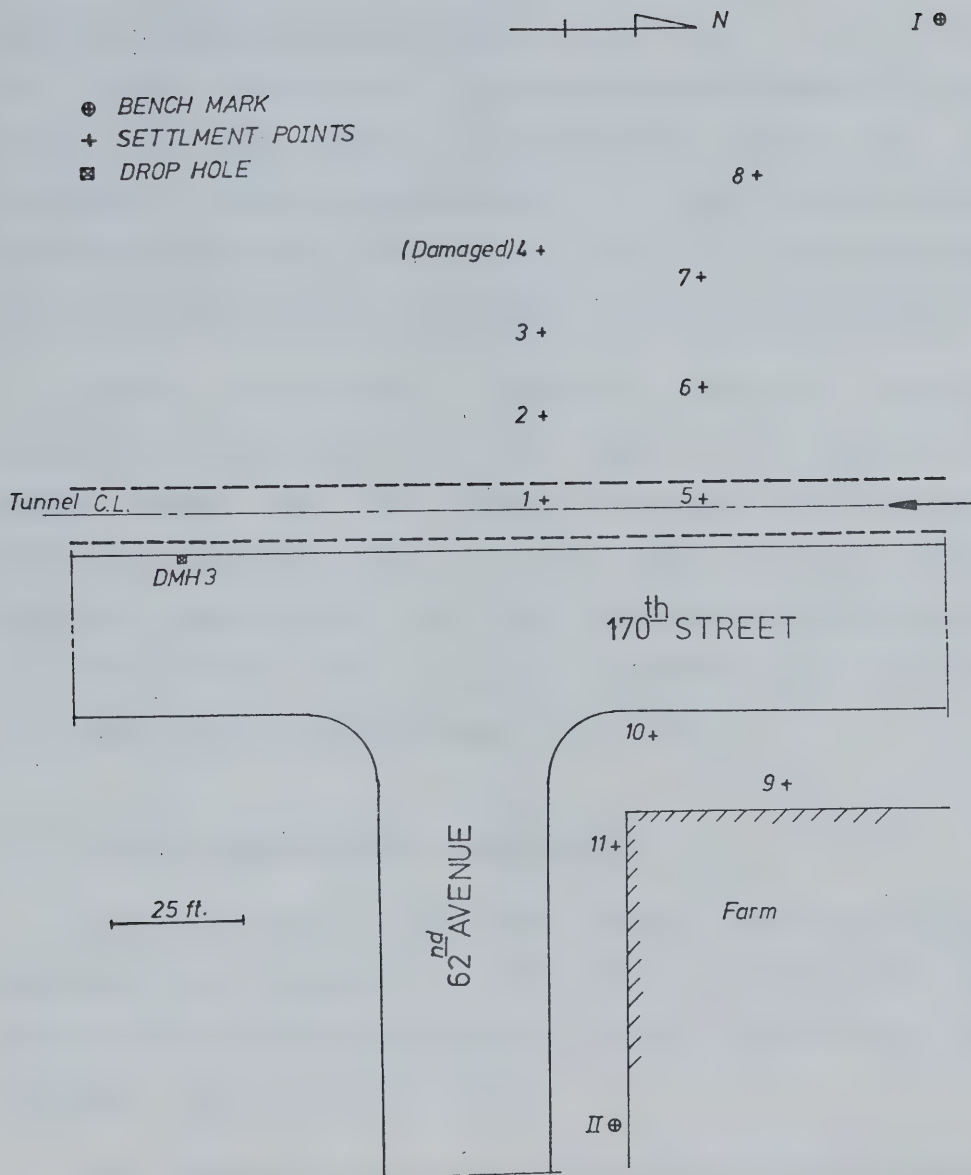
General Plan of the Settlement Points over the 170th Street Tunnel.
